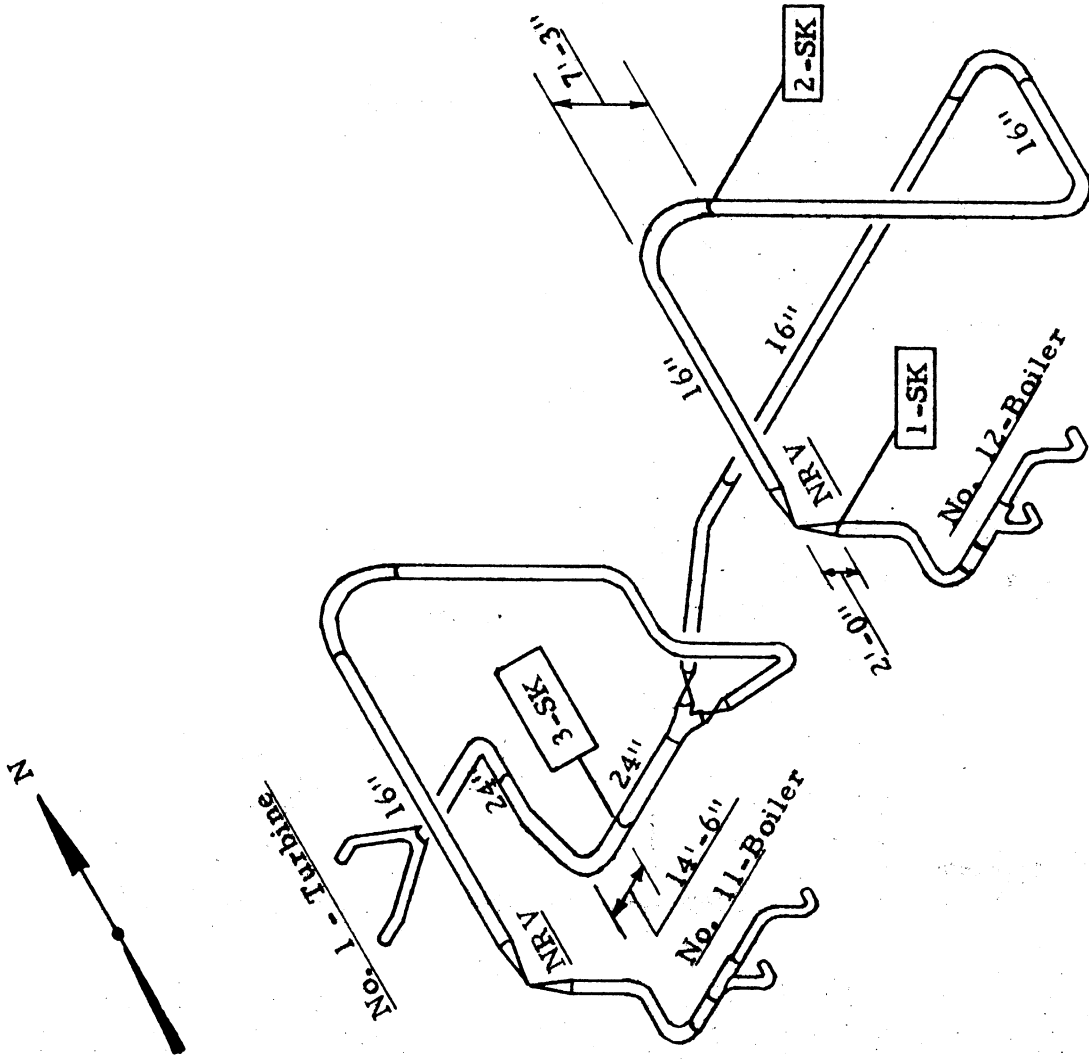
Sketch Submitted Showing Location of Weld-Prober Samples.
